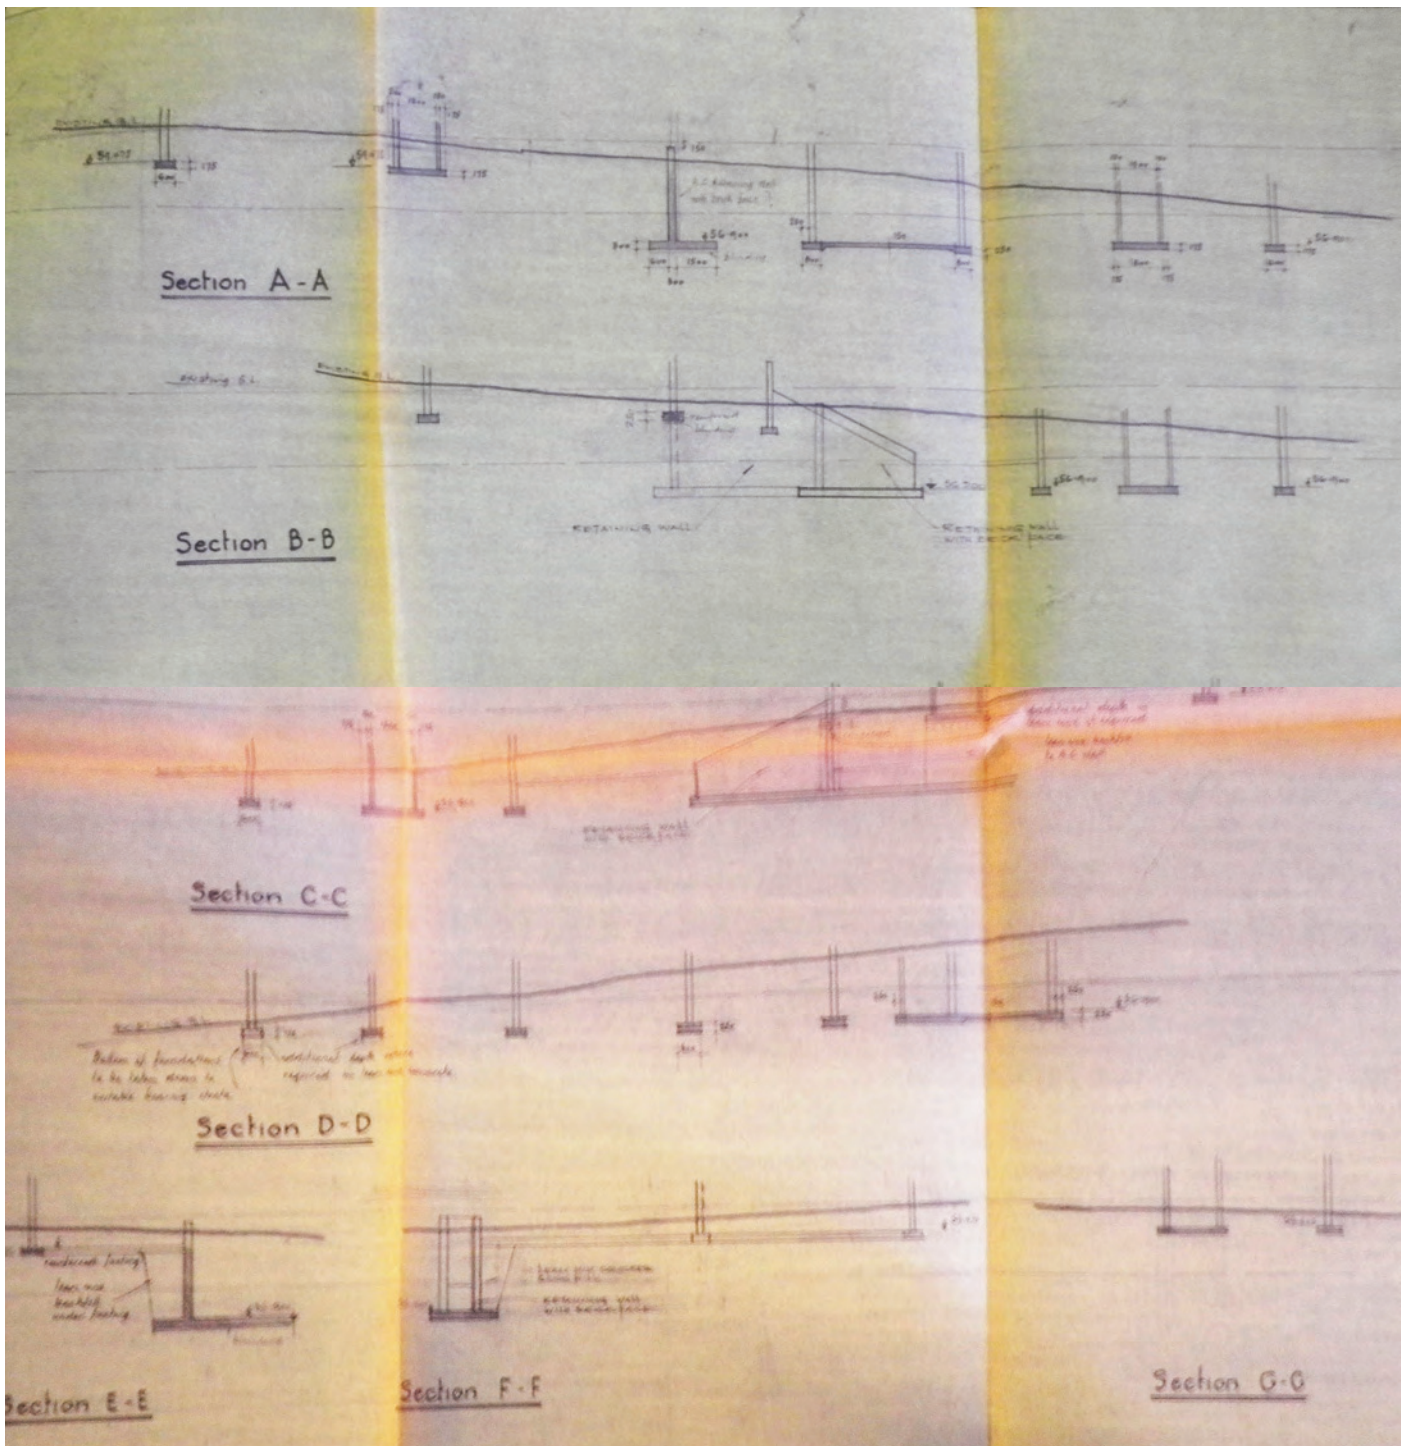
Architect's plan dated 1972 showing foundation profiles of Cloverdown EPH (BCC)
